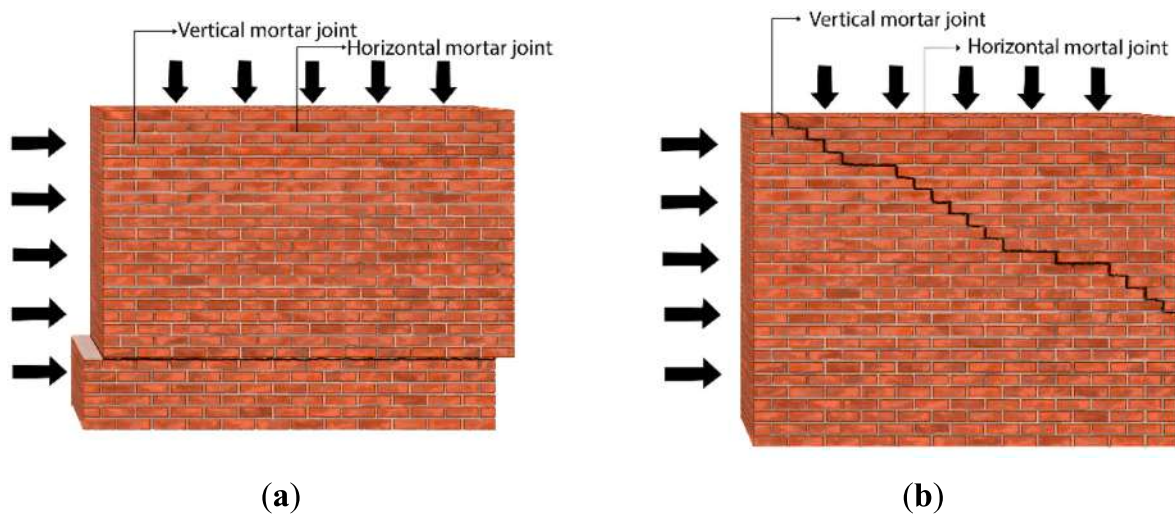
(a) Friction-shear failure mode: sliding along horizontal joints; (b) Friction-shear failure mode: sliding along horizontal and vertical joints in unreinforced masonry (URM) walls.
